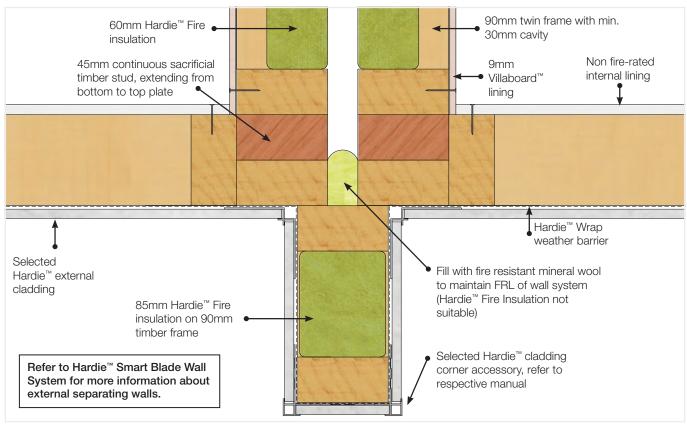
HARDIE™ SMART INTERTENANCY WALL SYSTEM TO NON-FIRE-RATED EXTERNAL CLADDING WALL
